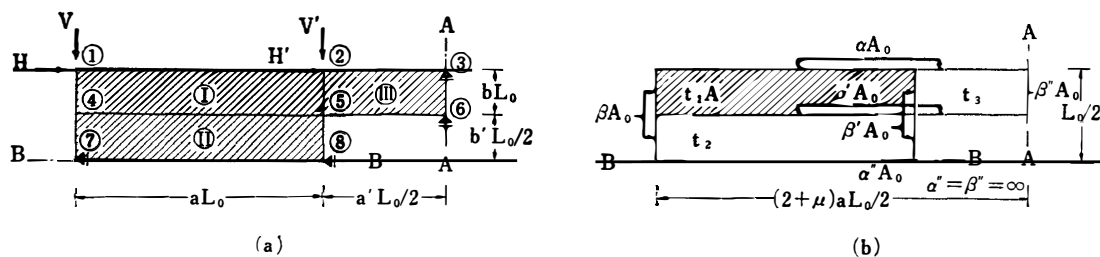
External forces and structural constants in the 1st quadrant of a wall.
